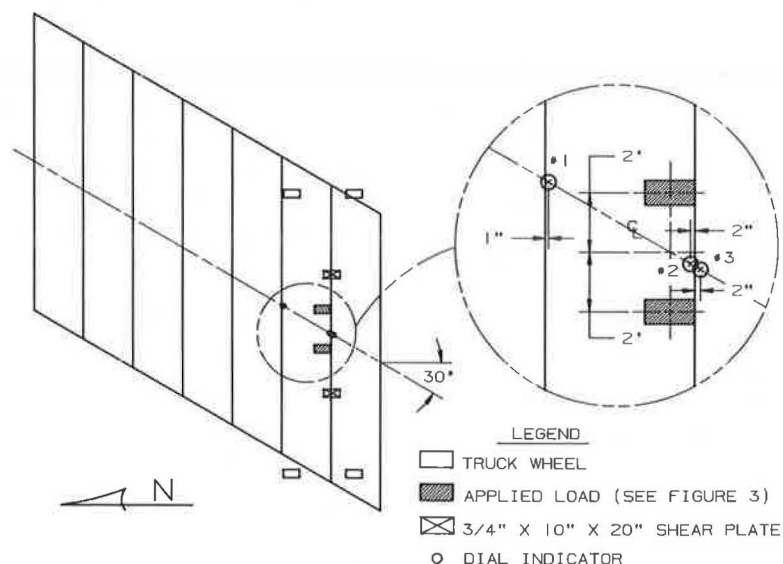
Test 1 (ungrouted without plates) and Test 2 (ungrouted with plates).
